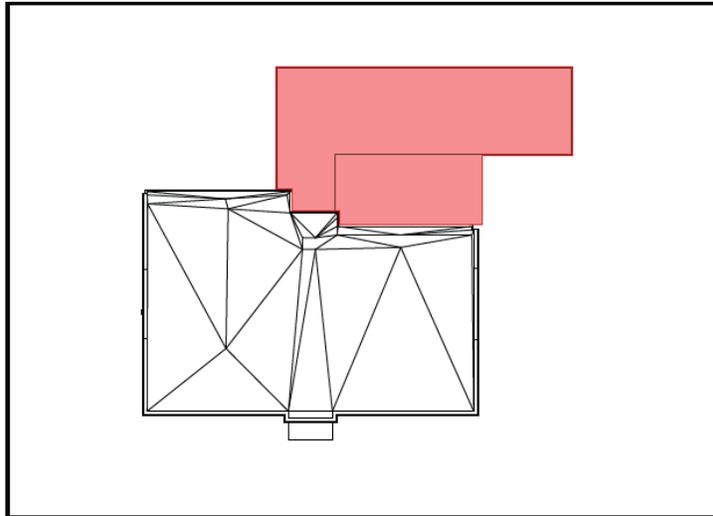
Roof plan of proposed demolition of rear annex. EVOQ.
